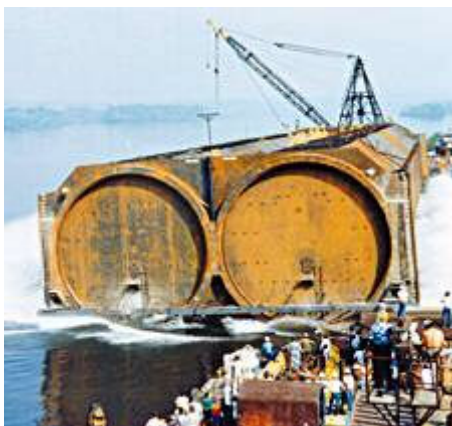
Launching Steel Element, Fort McHenry Tunnel, Baltimore, MD
